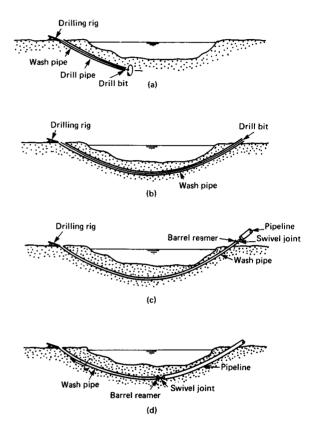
Directional drilling. (a) Stage 1: pilot hole drilled by advancing the drill string and overdrilling with the washover pipe in stages of approximately 80 m; (b) stage 2: pilot hole completed when both drill string and washover pipe exit on opposite bank; (c) stage 3: drill pipe is removed, barrel reamer connected to washover pipe which is in turn connected to the pipeline pulling head by a swivel joint; (d) stage 4: the barrel reamer is pulled back and rotated by the drill rig positioning the non-rotating pipeline into the formed hole
